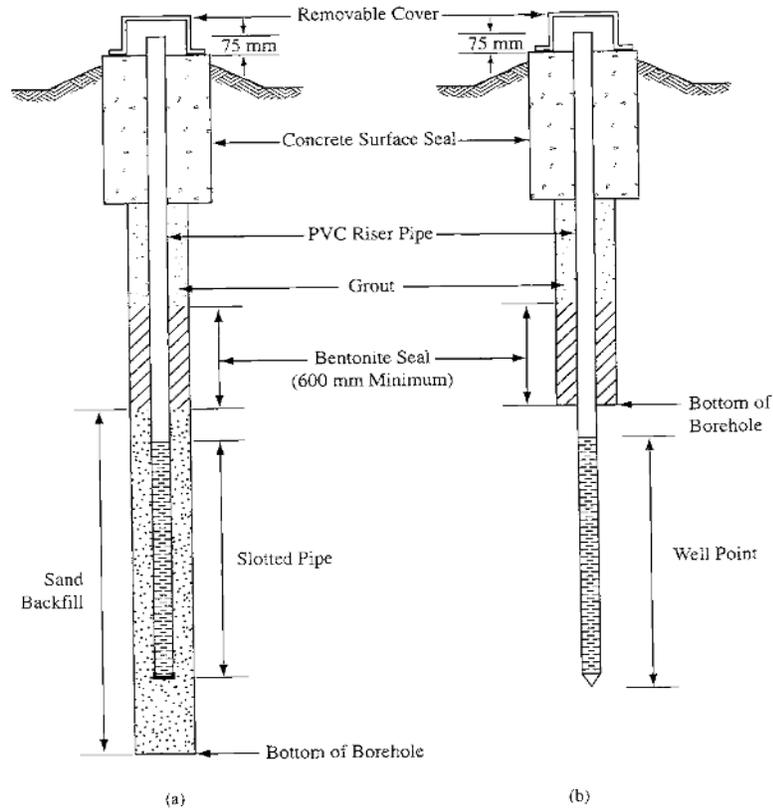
Representative Details of Observation Well Installations. (a) Drilled-in-place Stand-Pipe Piezometer, (b) Driven Well Point.
